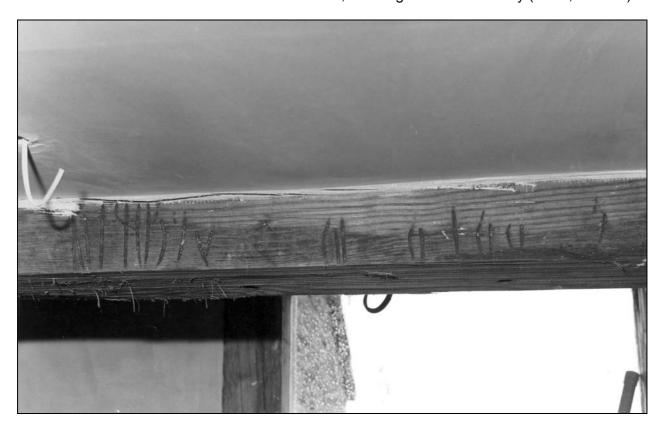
Roof structure in lean-to cart shed at north-east corner, from the south (film 1, frame 13)
